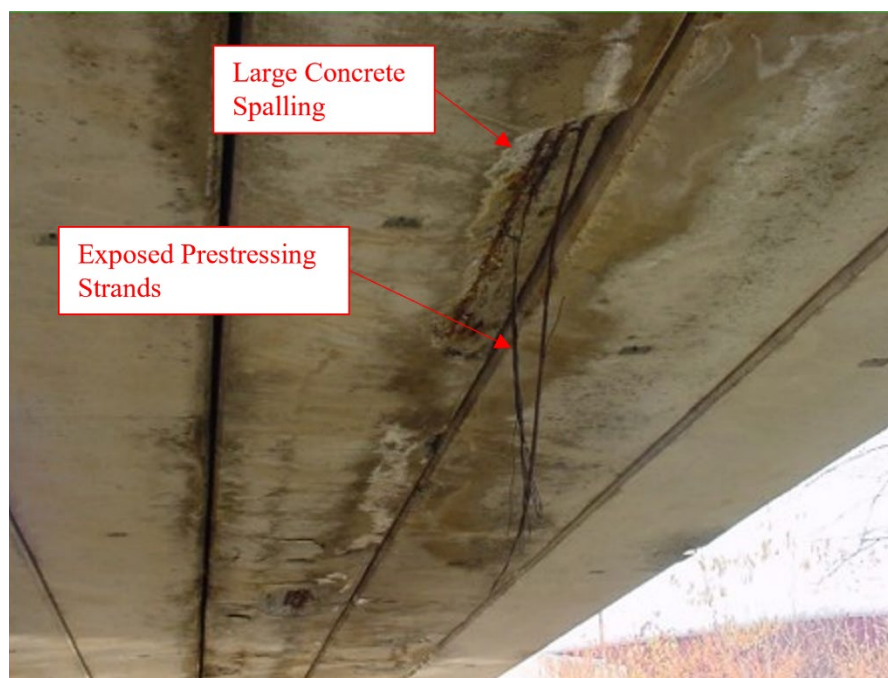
Spalling and Exposed, Severed Prestressing Strands in a Prestressed NCABB
